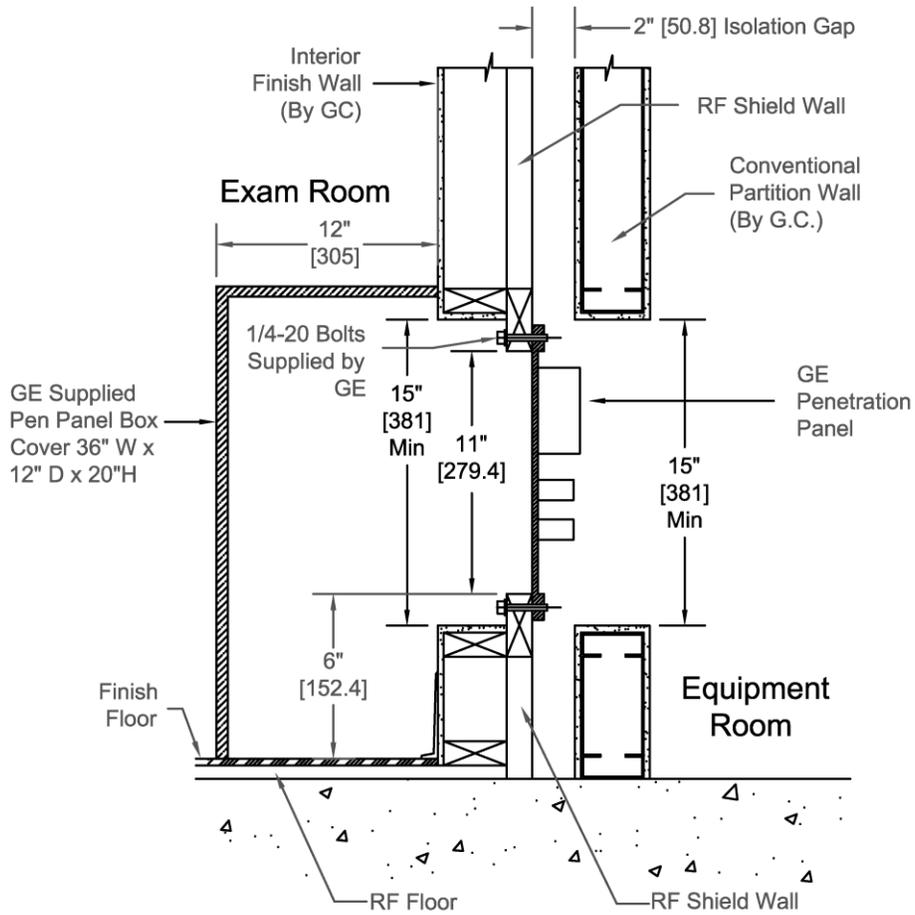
Pen Panel wall section. Typical shown. Shield wall/floor detail may vary with RF subcontractor.
